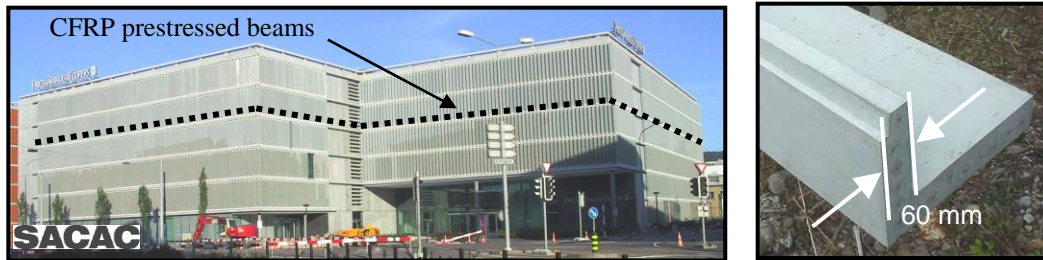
Use of precast CFRP pretensioned HPSCC members in a building envelope (Terrasi, 2007)
